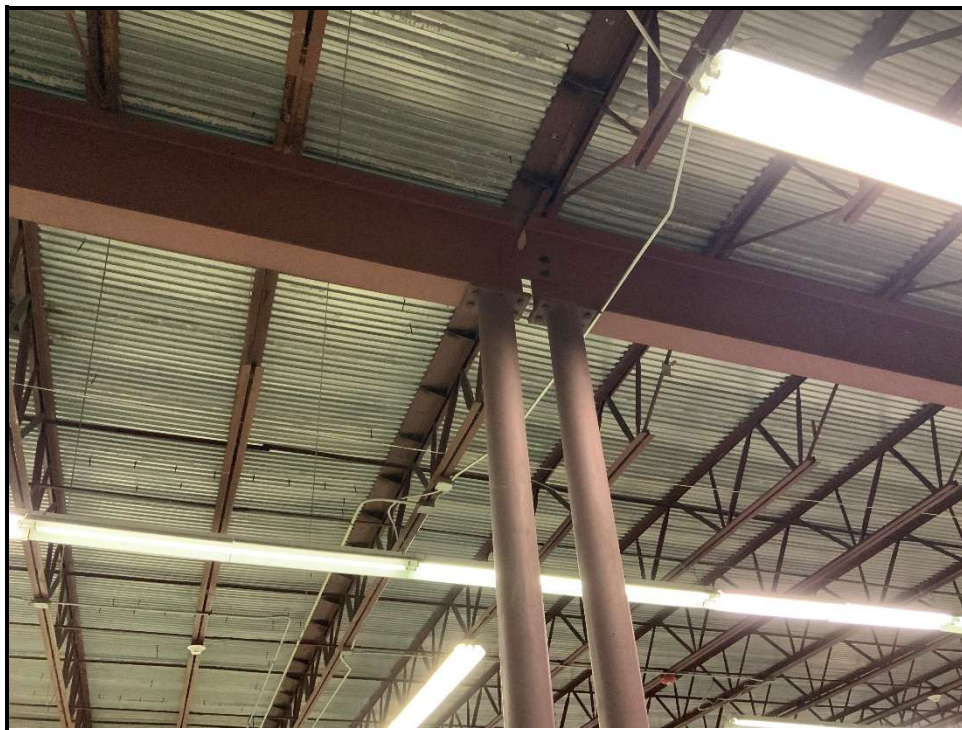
South west wing typical roof framing and construction/expansion joint
